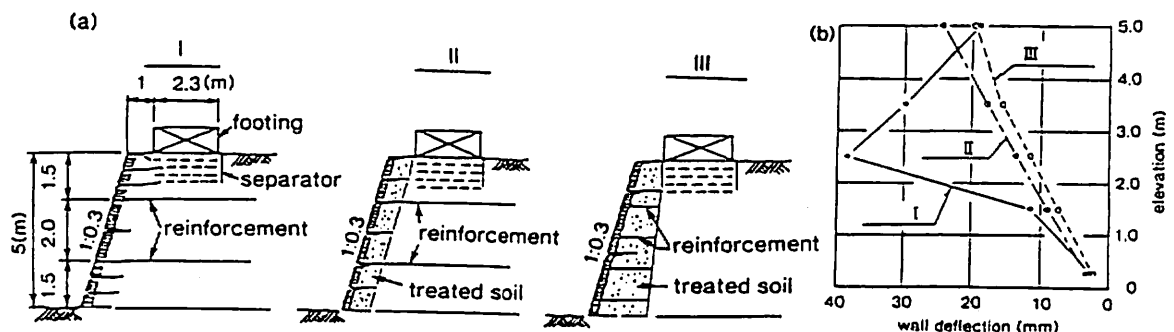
Three test walls loaded from the crest: (a) wall configurations, and (b) the outward horizontal displacement at the wall face by loading of $q = 1.3 \text{ kgf/cm}^2$ on an area with a width of 2.3 m on the crest (Kawasaki et al., 1990).
